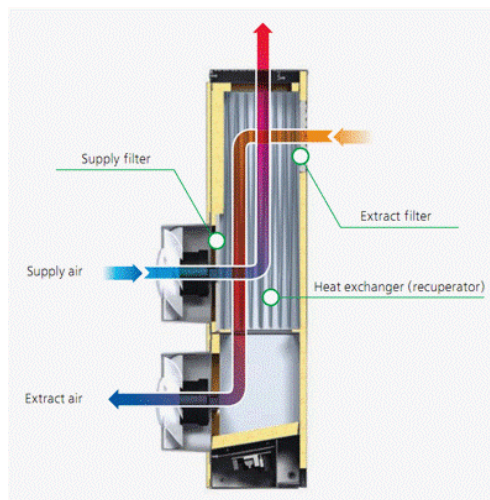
Individual ventilation wall mounted unit with heat recovery (sample 1)
